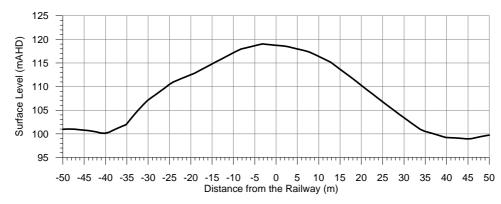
Cross-section through Embankment 75.7 km - Looking East (Up Track)
